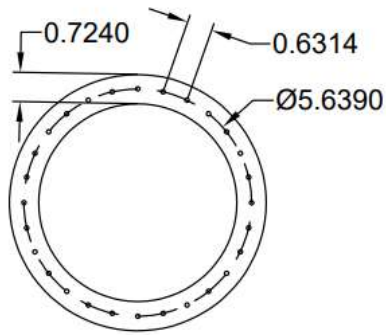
200 m cross section at 150 m, 28 ducts.
